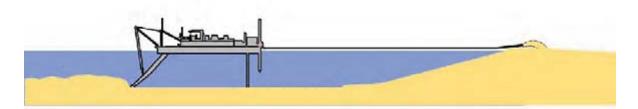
Typical Cross Section Illustrating Dredging Operation using Cutter Suction Dredger
